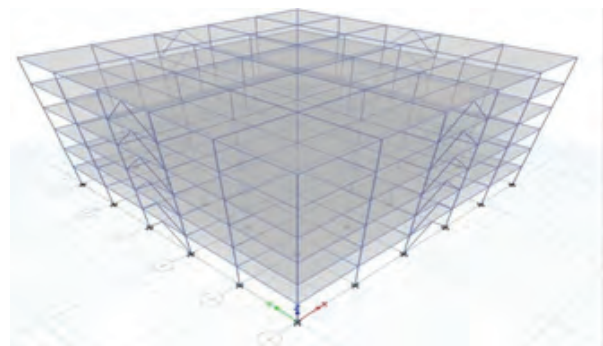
3D model of G+5 storey building with inverted-V pattern BRBs at the centre of building
